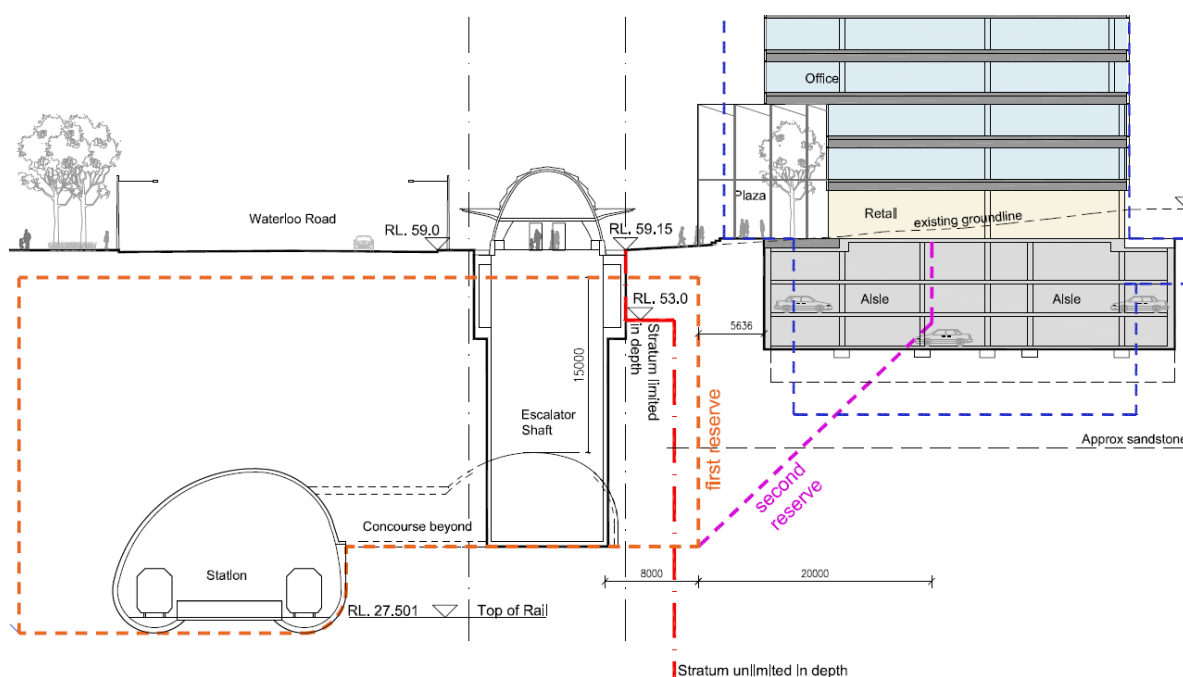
Section of the basement beneath Building A and the Epping to Chatswood Railway Line infrastructure
